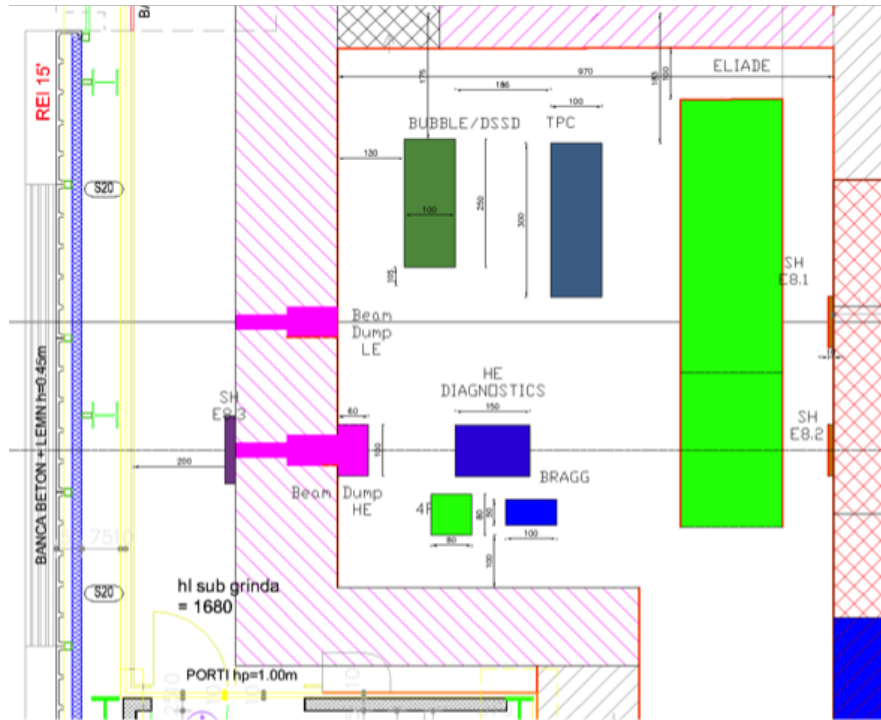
Illustration of the beam dumps in the E8 vault. The beam dumps are embedded in the external concrete vault on the left.
